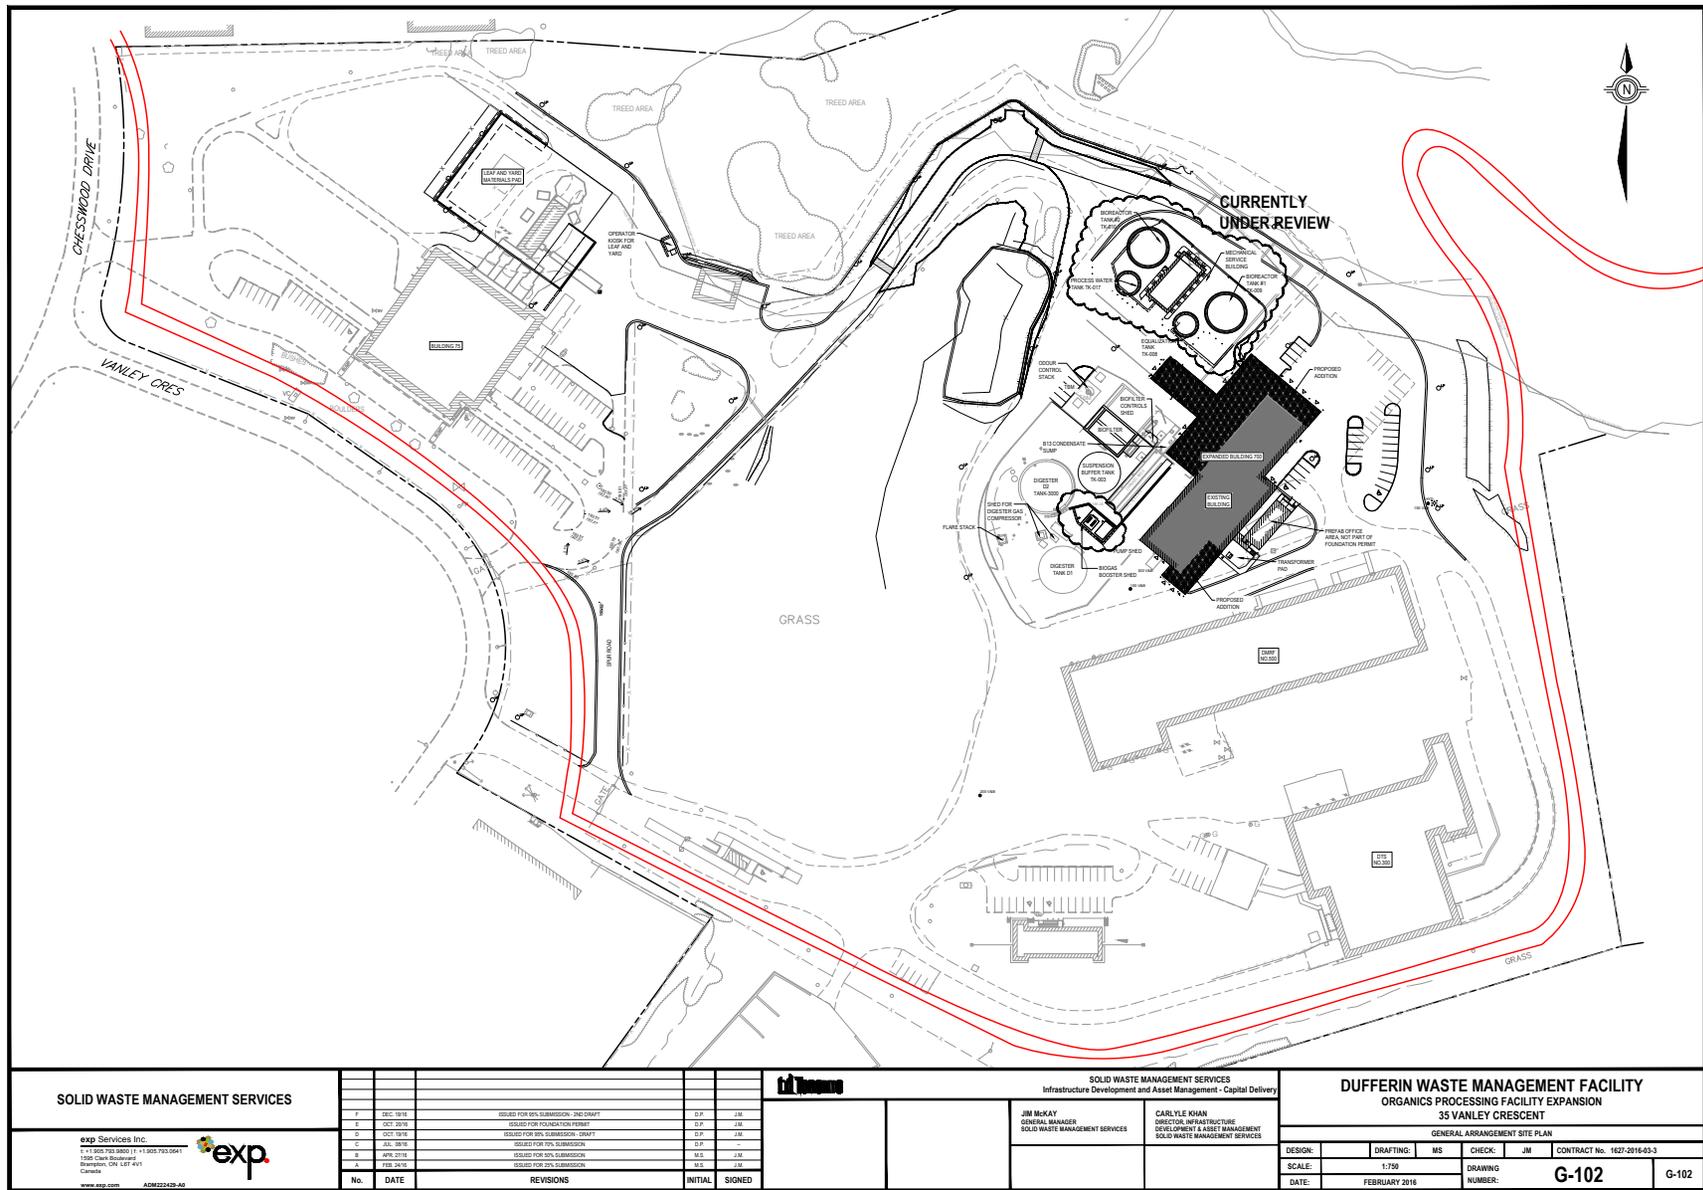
Proposed Site Plan with future path drawn in. Site Plan Source City of Toronto.
